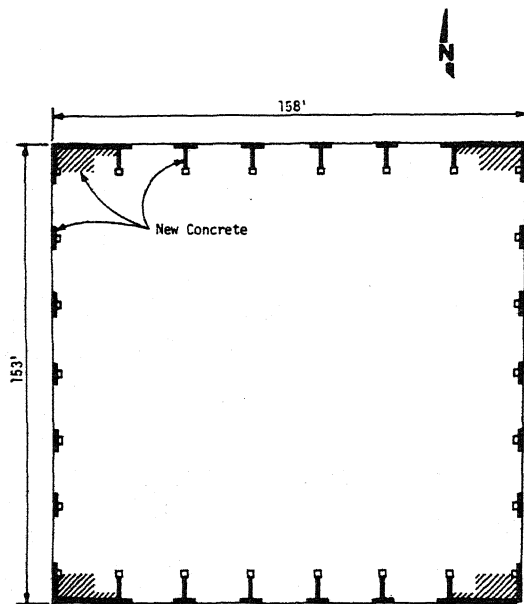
PROPOSED MODIFICATION SCHEME, PLAN BELOW SEVENTH FLOOR
